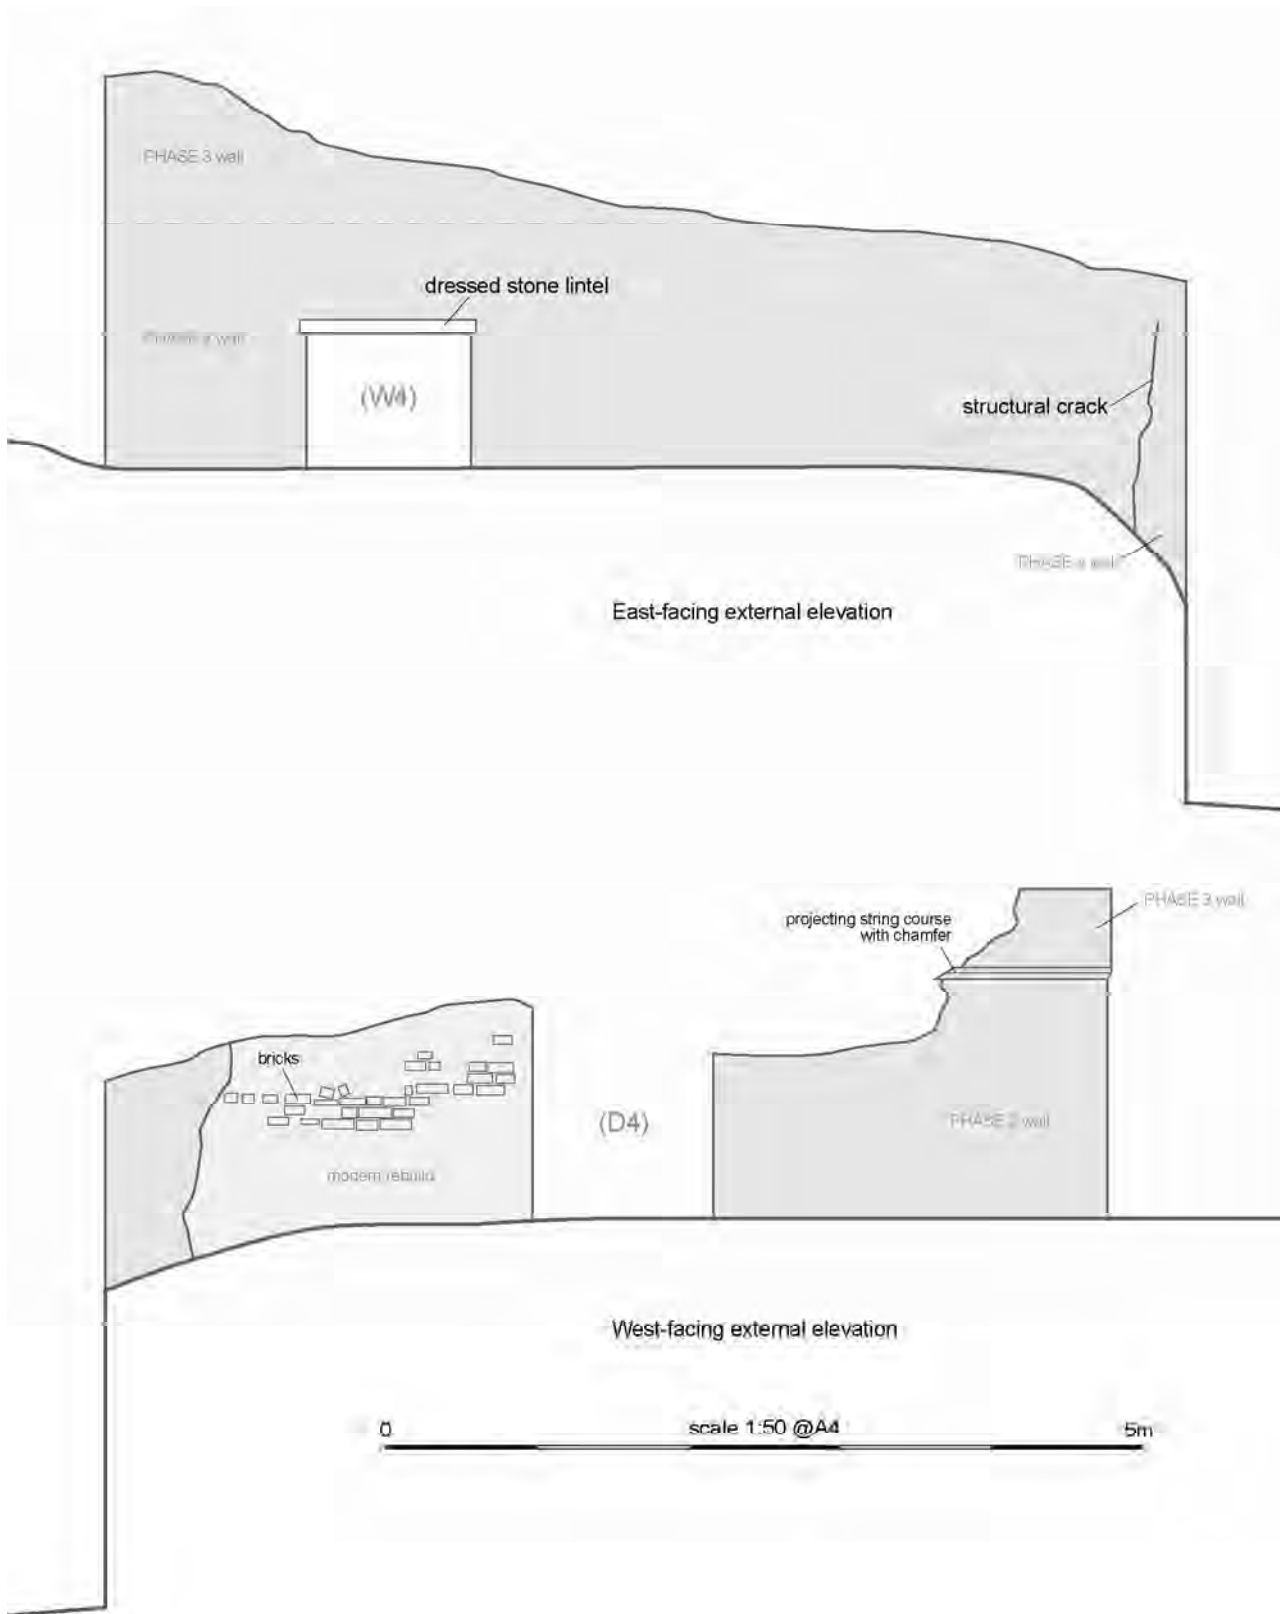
East- and west-facing external elevations (based on architects drawings, with additions).
